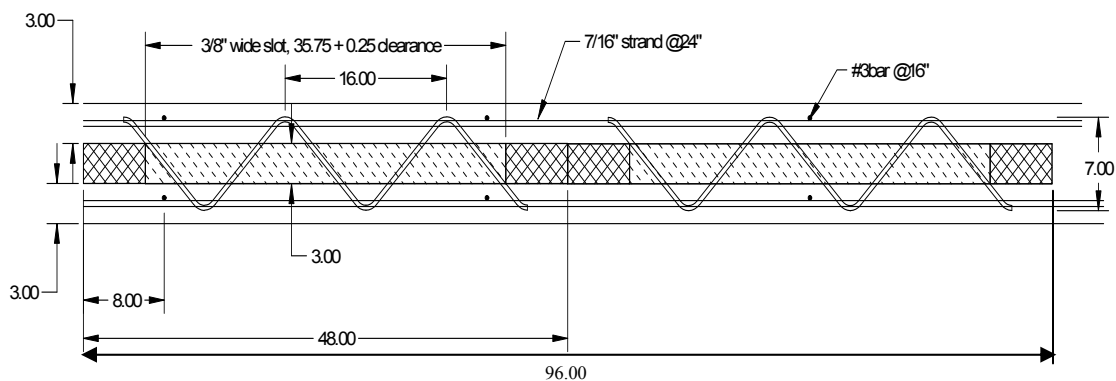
Details of full-scale specimen (using NU-Tie-V4 connector), with #3 bar @ 16 in. as transversal reinforcement
